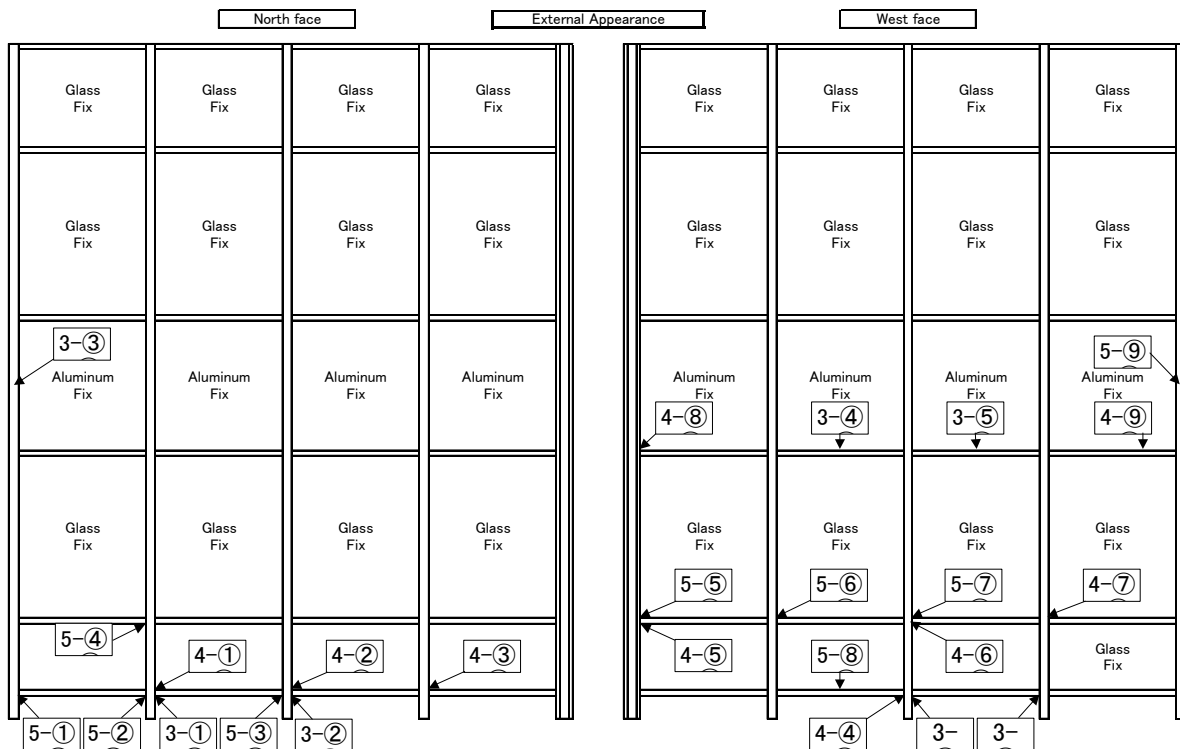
Place of damage of curtain wall in the test of Case 3) Case 4) and Case 5)
